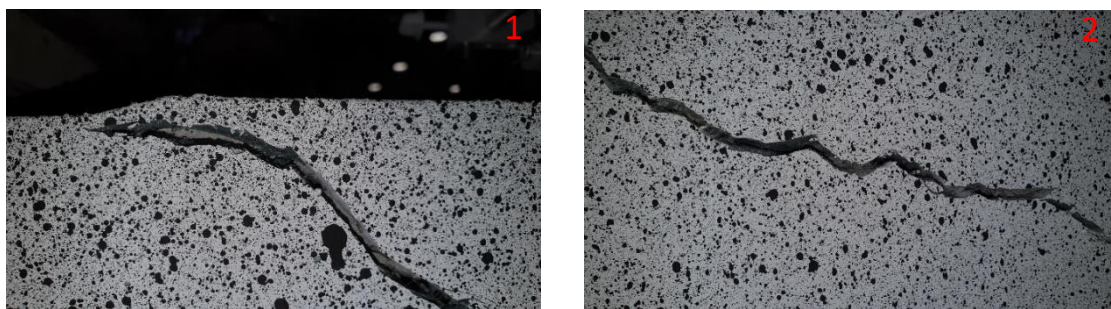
Close-up on the details indicated in Figure above. Detail 1: crack penetrates through SHCC K1 laminate and normal concrete. Detail 2: upper part of K1 laminate slip.
